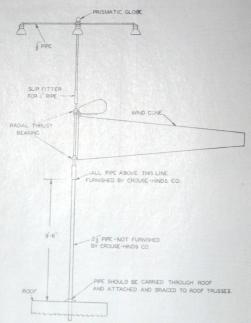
Installation Details of Wind Cone Support and Lighting Fixture Mounted on Roof
